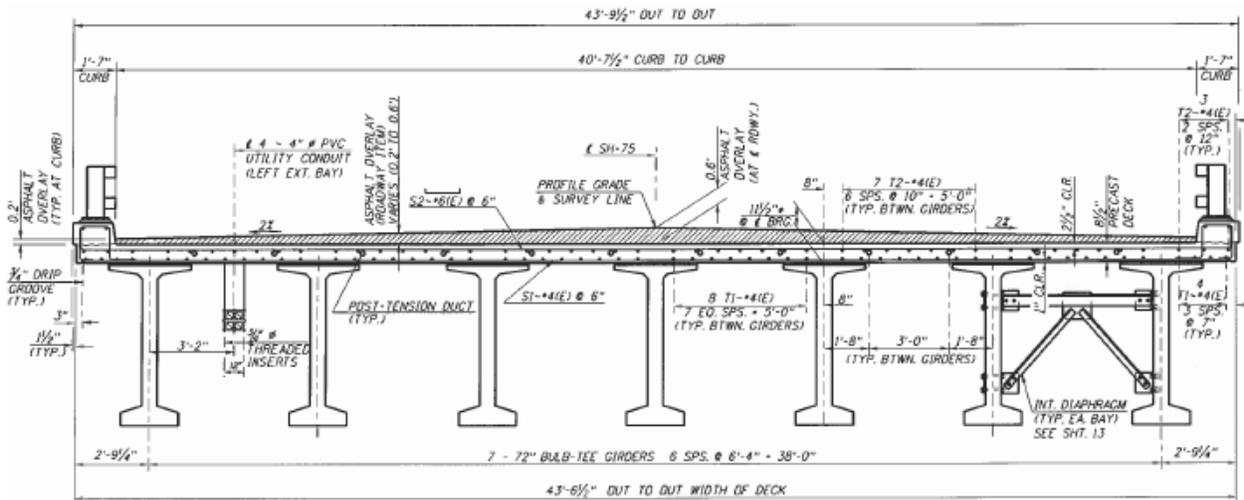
Diagram. Typical section of new East Fork Salmon River Bridge.
